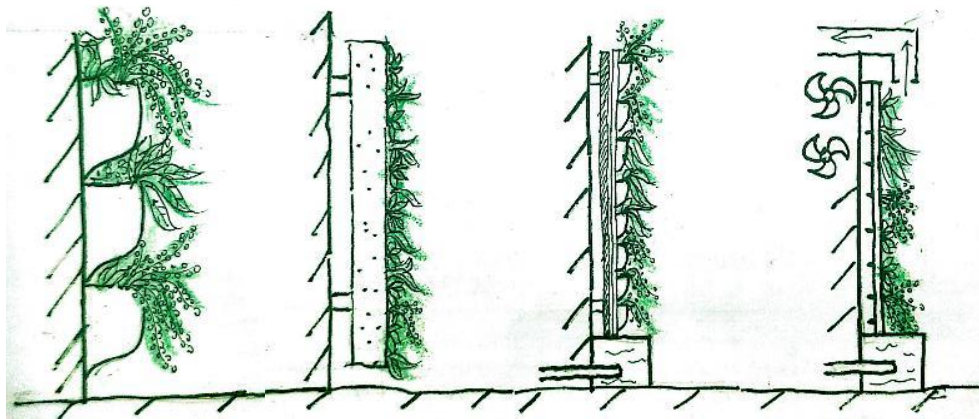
Living wall system: Modular system-planter box (left 1); Modular system-tray or foam basement (left 2); Hydroponic system (left 3); Bio-filtration system (left 4)
